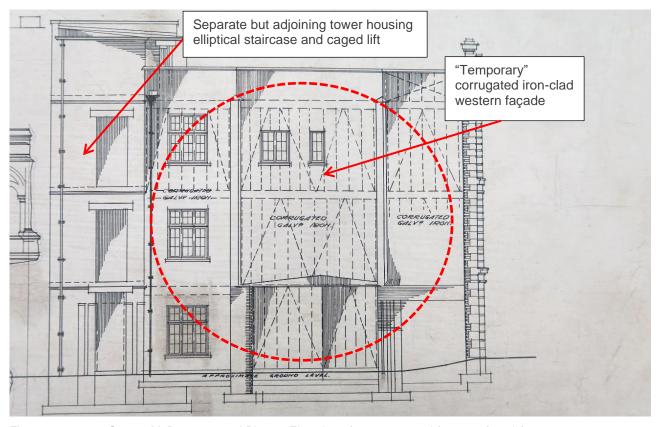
1916 George McRae proposed Plans – Elevation of temporary end (western façade)
